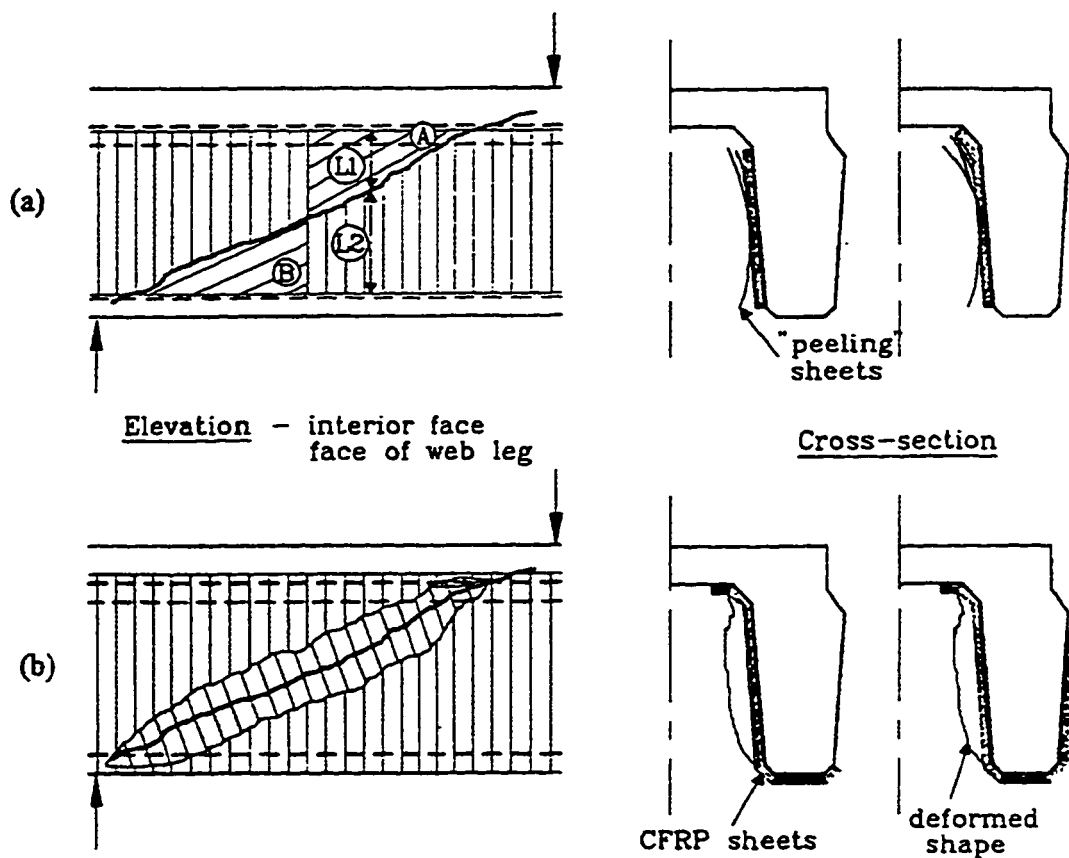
Shear Failures of Concrete Girders Reinforced with CFRP Sheets for Shear and Flexure (Drimoussis and Cheng, 1994)
